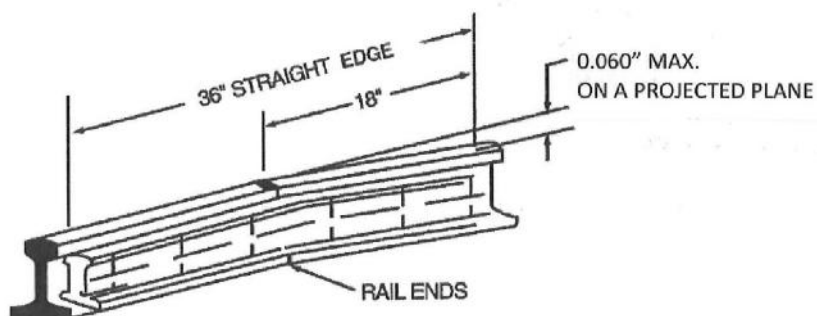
Elevation of Joint Showing Misalignment Tolerance in Vertical Alignment per Article 3.8.6.2
